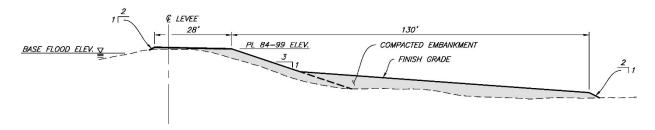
Typical Cross Section II, Sta. 330+00 – 368+00
